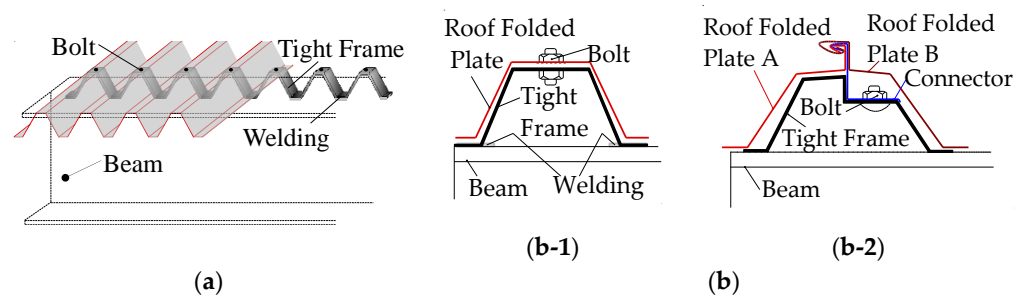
Detail of beam–roof plate joint. (a) Beam length direction and (b) cross-sectional direction: (b-1) cross section A and (b-2) cross section B.
